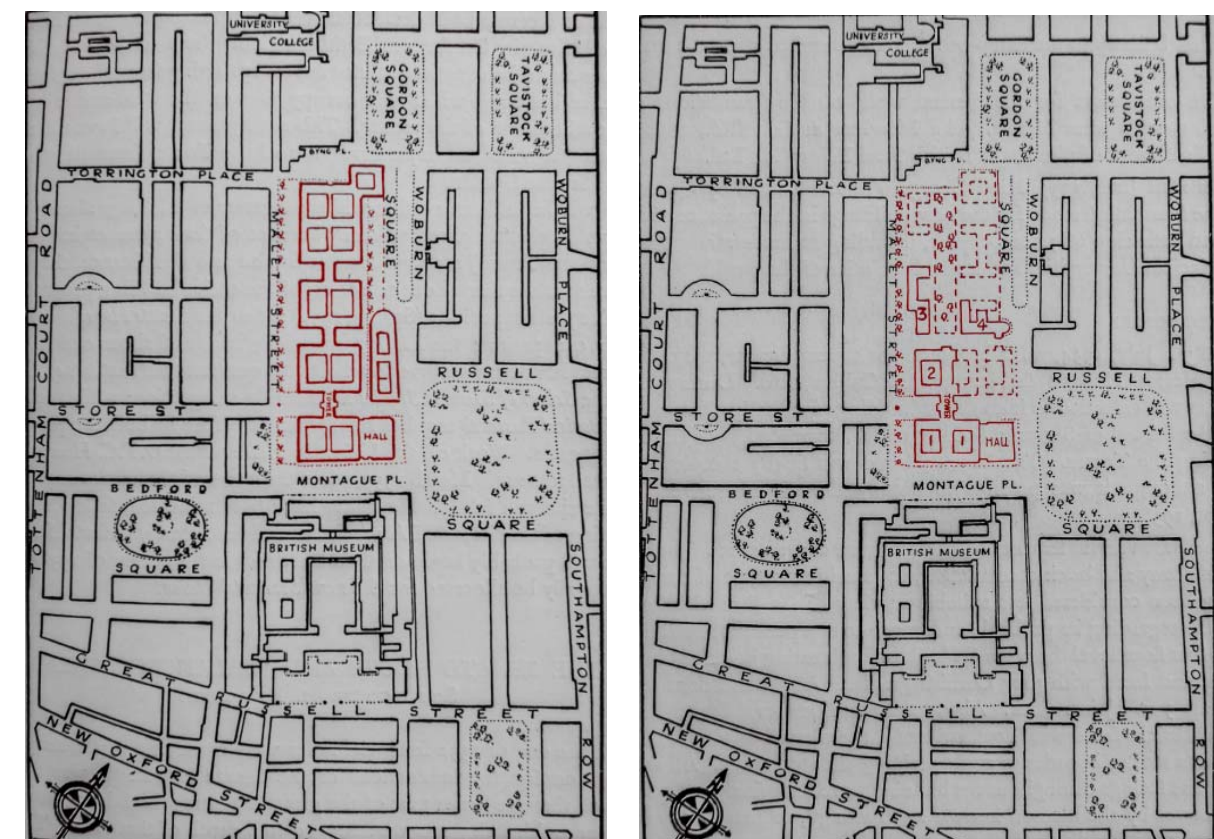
Two plans showing the original (left) and revised layout (right) of the site. Source: RIBA Library.
